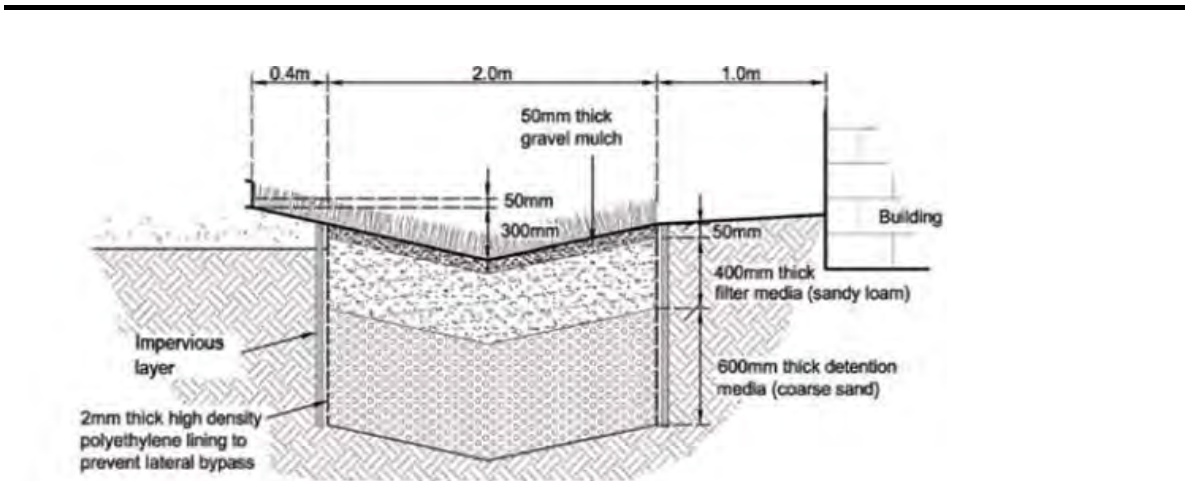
Example of a rain garden design (from DoW, 2008). Note that the rain gardens will not be located adjacent to buildings.
